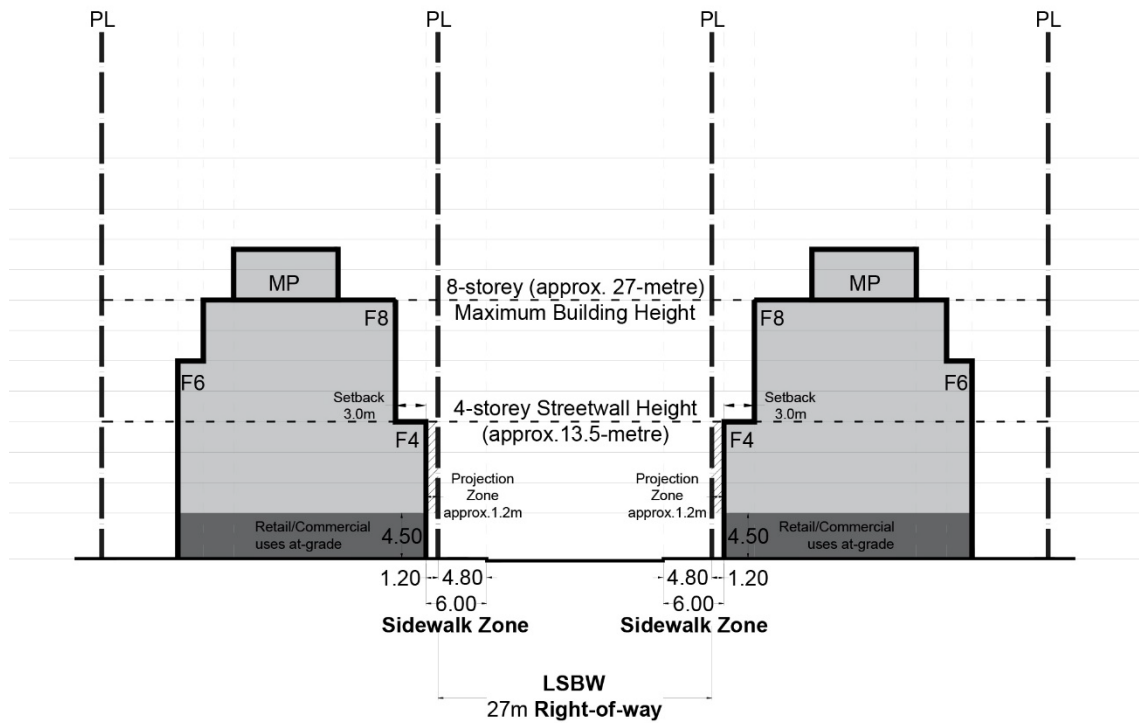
Demonstration of an 8-storey mid-rise building with a 4-storey street wall
